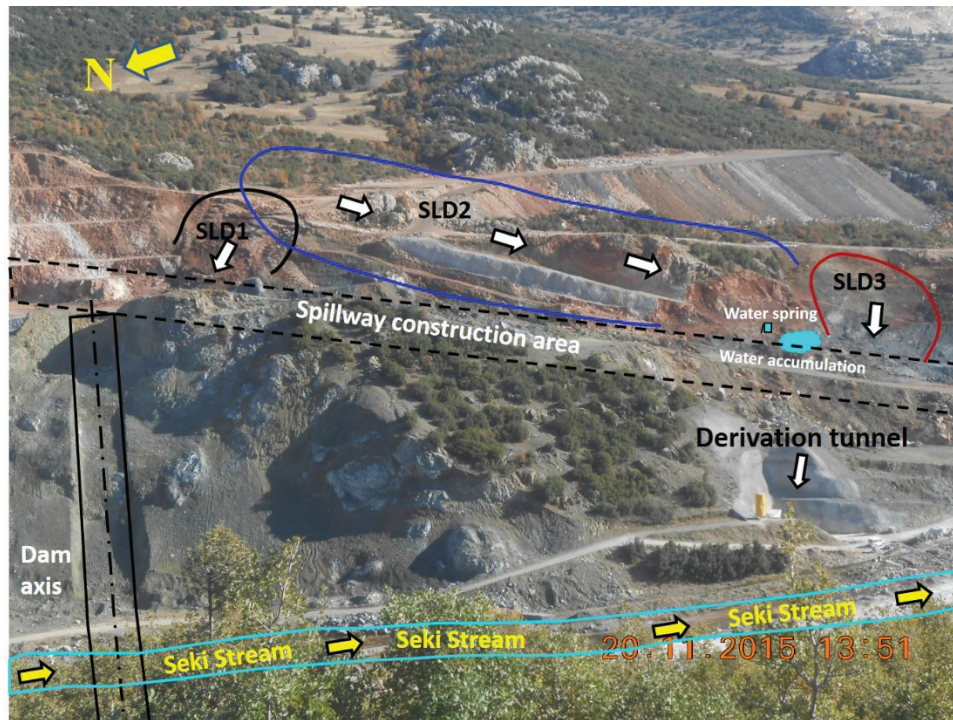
Slope failures took place in spillway construction site in the left abutment area.
